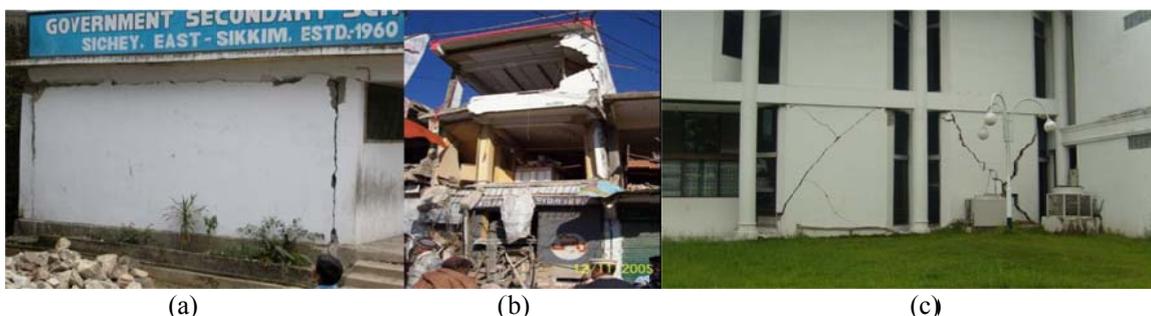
Failure of infill masonry walls: (a) Out-of-plane tilting of masonry infill wall (India); (b) Out-of-plane failure of infill walls in Pakistan (Bothara et al., 2008); (c) Diagonal failure of infill walls separated from columns, Indonesia
